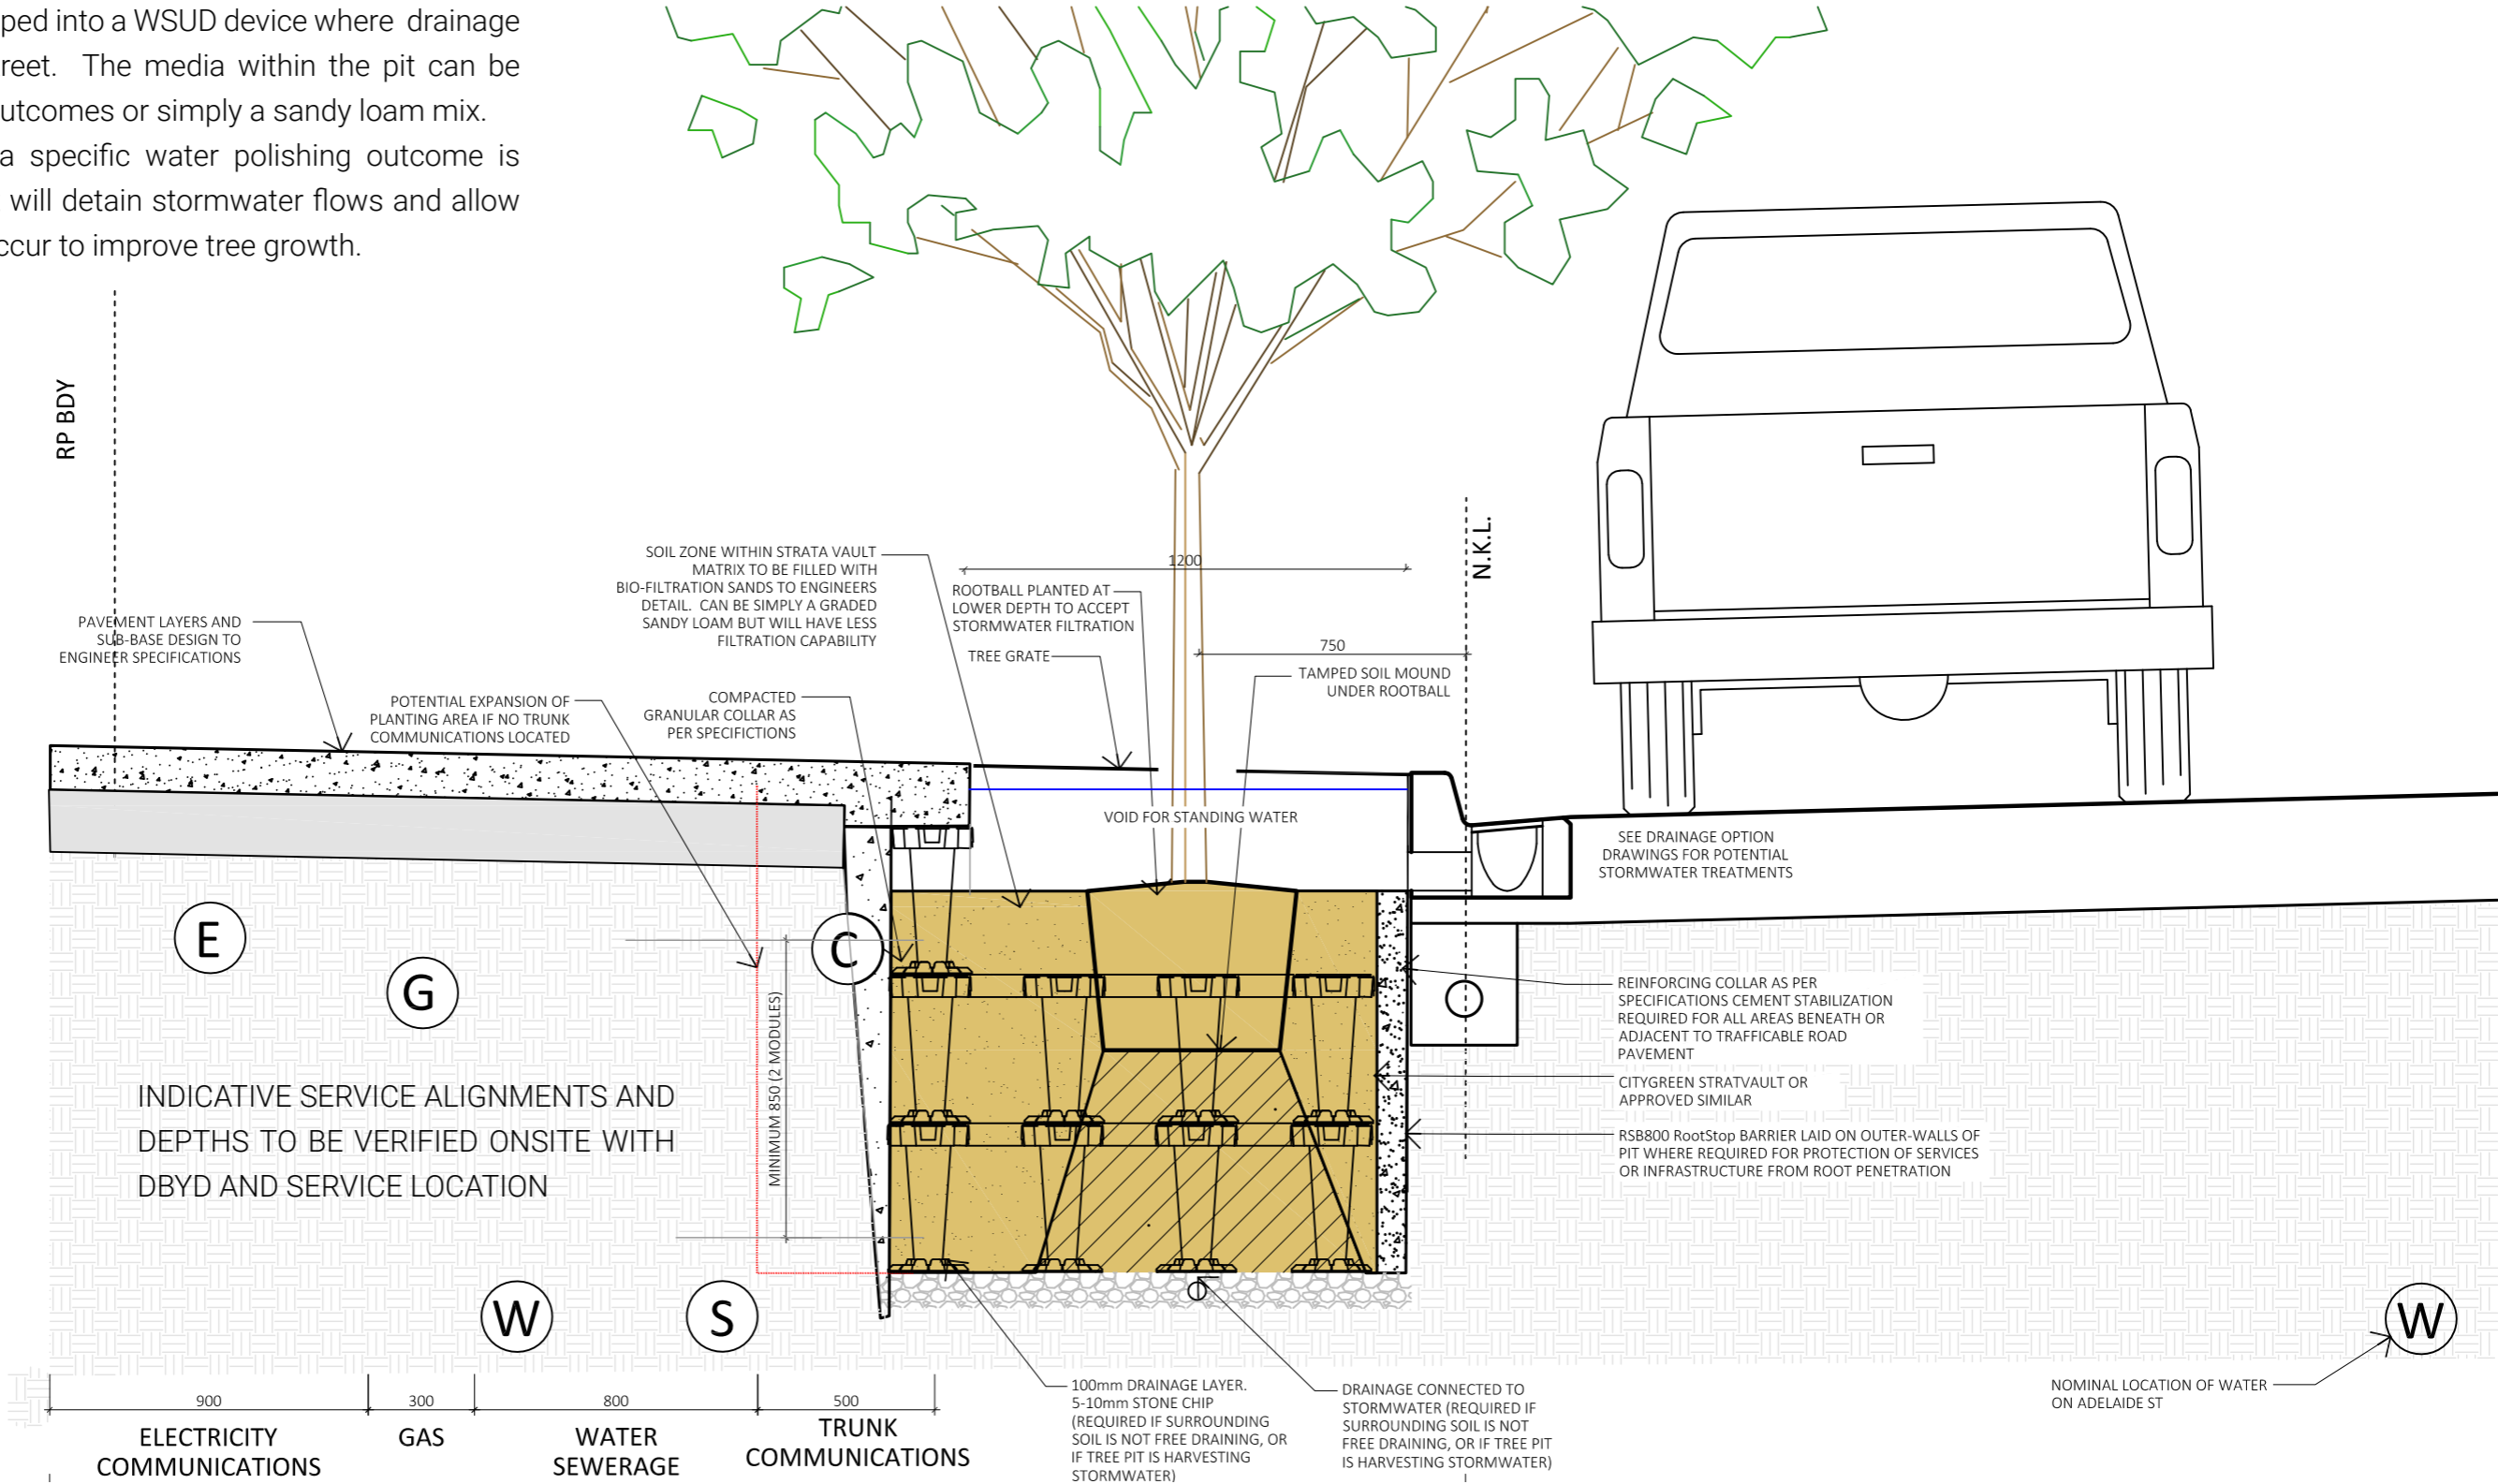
B - TREE TRENCH IN CARPARK ZONE
